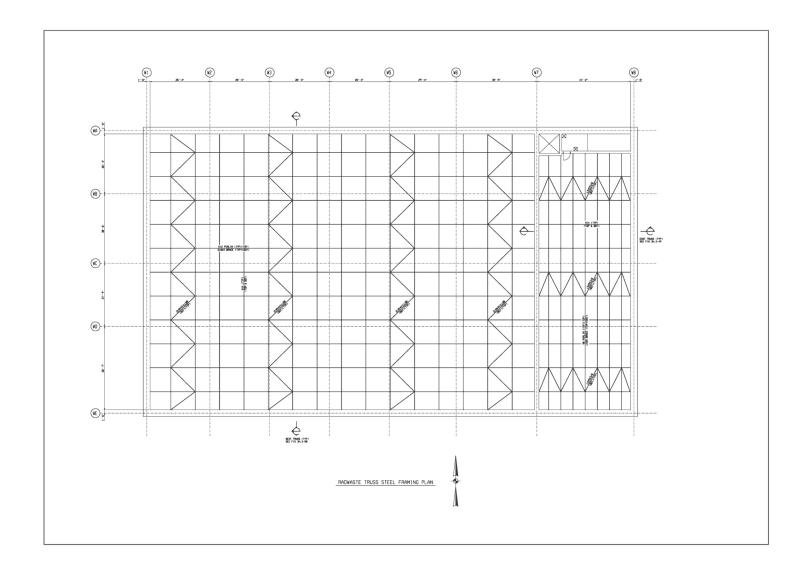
H.3-47 Roof Truss. Purlin and Horizontal Bracing Layout (Plan View)
